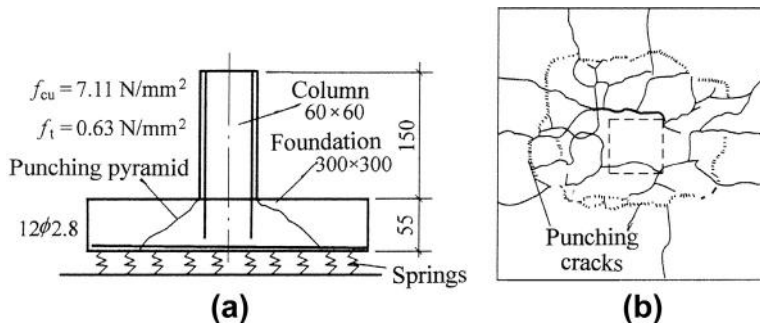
Punching of elastically supported slab [14-23]: (a) specimen (M89), (b) cracks on bottom surface
